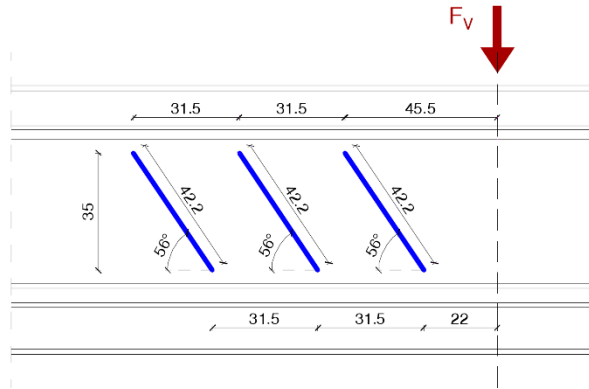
Detail of potentiometers arranged diagonally to intercept the inclined cracks.
